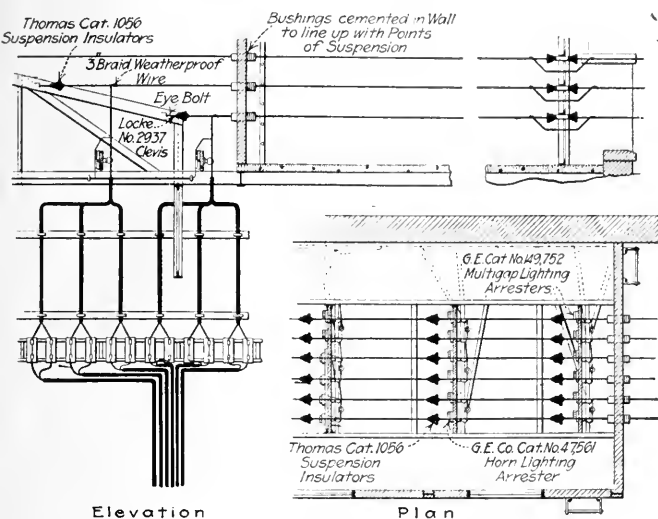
SCHEMATIC ARRANGEMENT OF WIRING BETWEEN DISCONNECTING SWITCHES AND OUTGOING CIRCUITS
